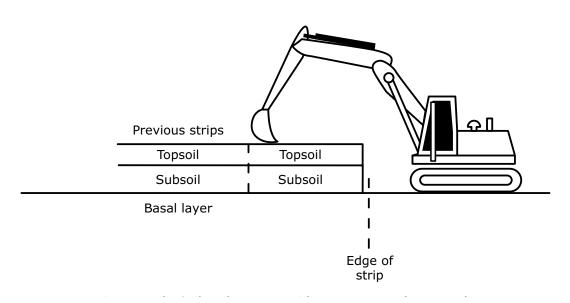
Soil replacement with excavators - dump trucks: Topsoil layer.
